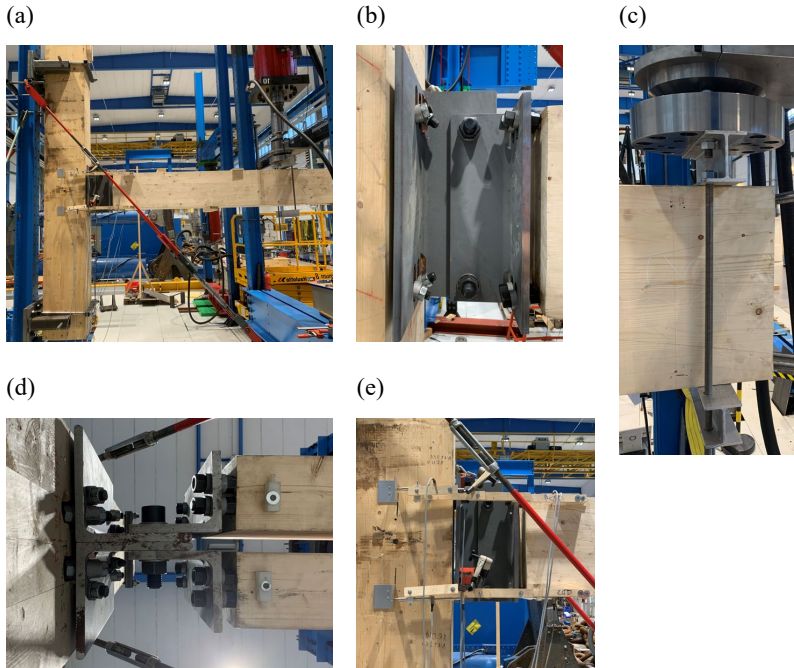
Detailed experimental set-up: (a) experimental set-up, (b) steel coupling part, (c) load application, (d) bottom-view of the connection, (e) locations of LVDTs
